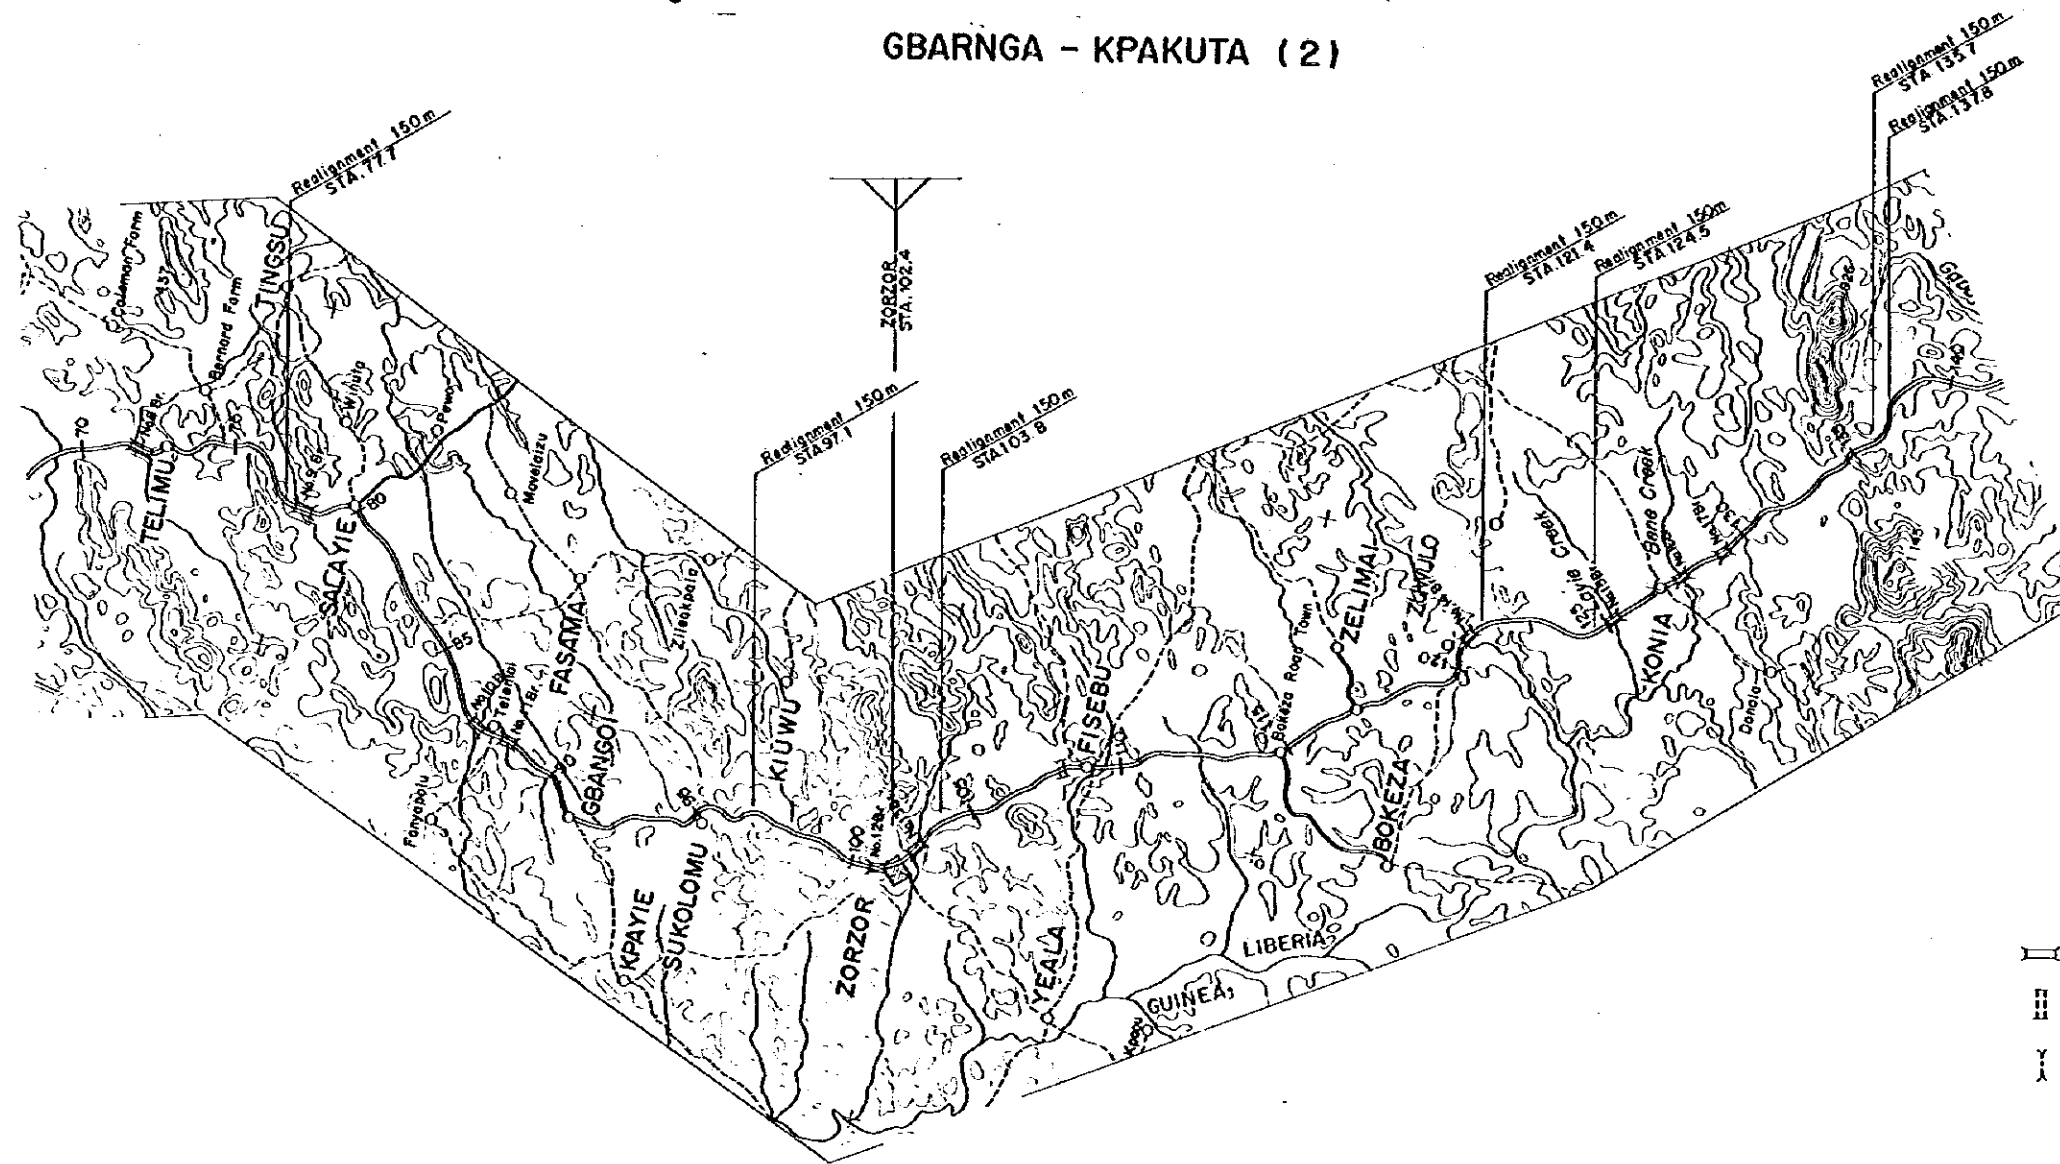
(2) ROAD PLAN AND PROFILE
